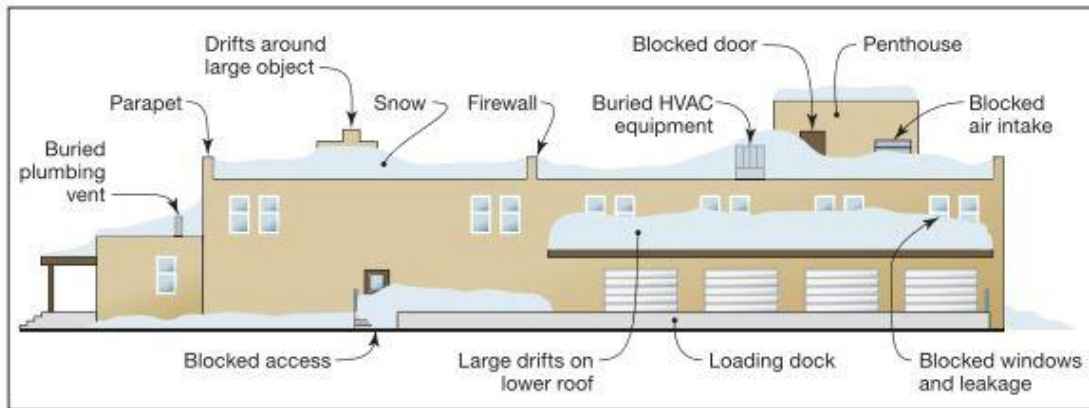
Unbalanced snow load from drifting and sliding snow on typical commercial or industrial building
